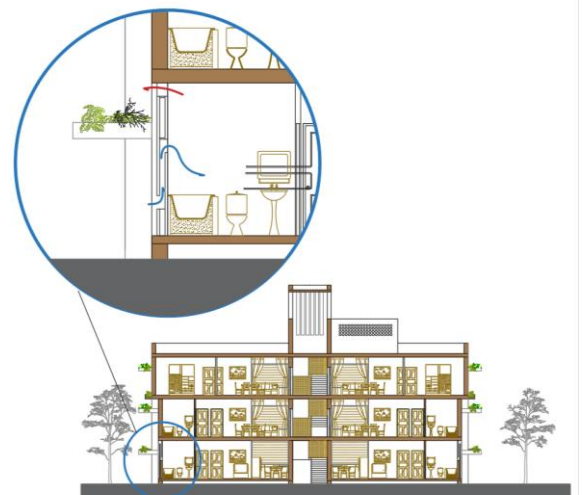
Bathroom Ventilation Details- Northwestern bathrooms
